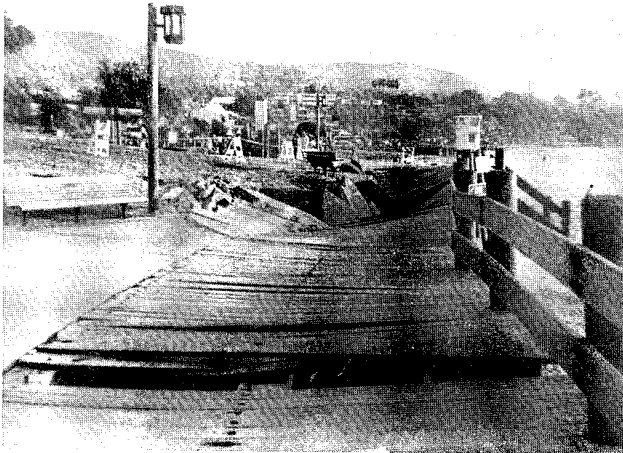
Sections of the main boardwalk at Laguna Beach collapsed after heavy wave surge eroded the sand and undermined piling foundations.
